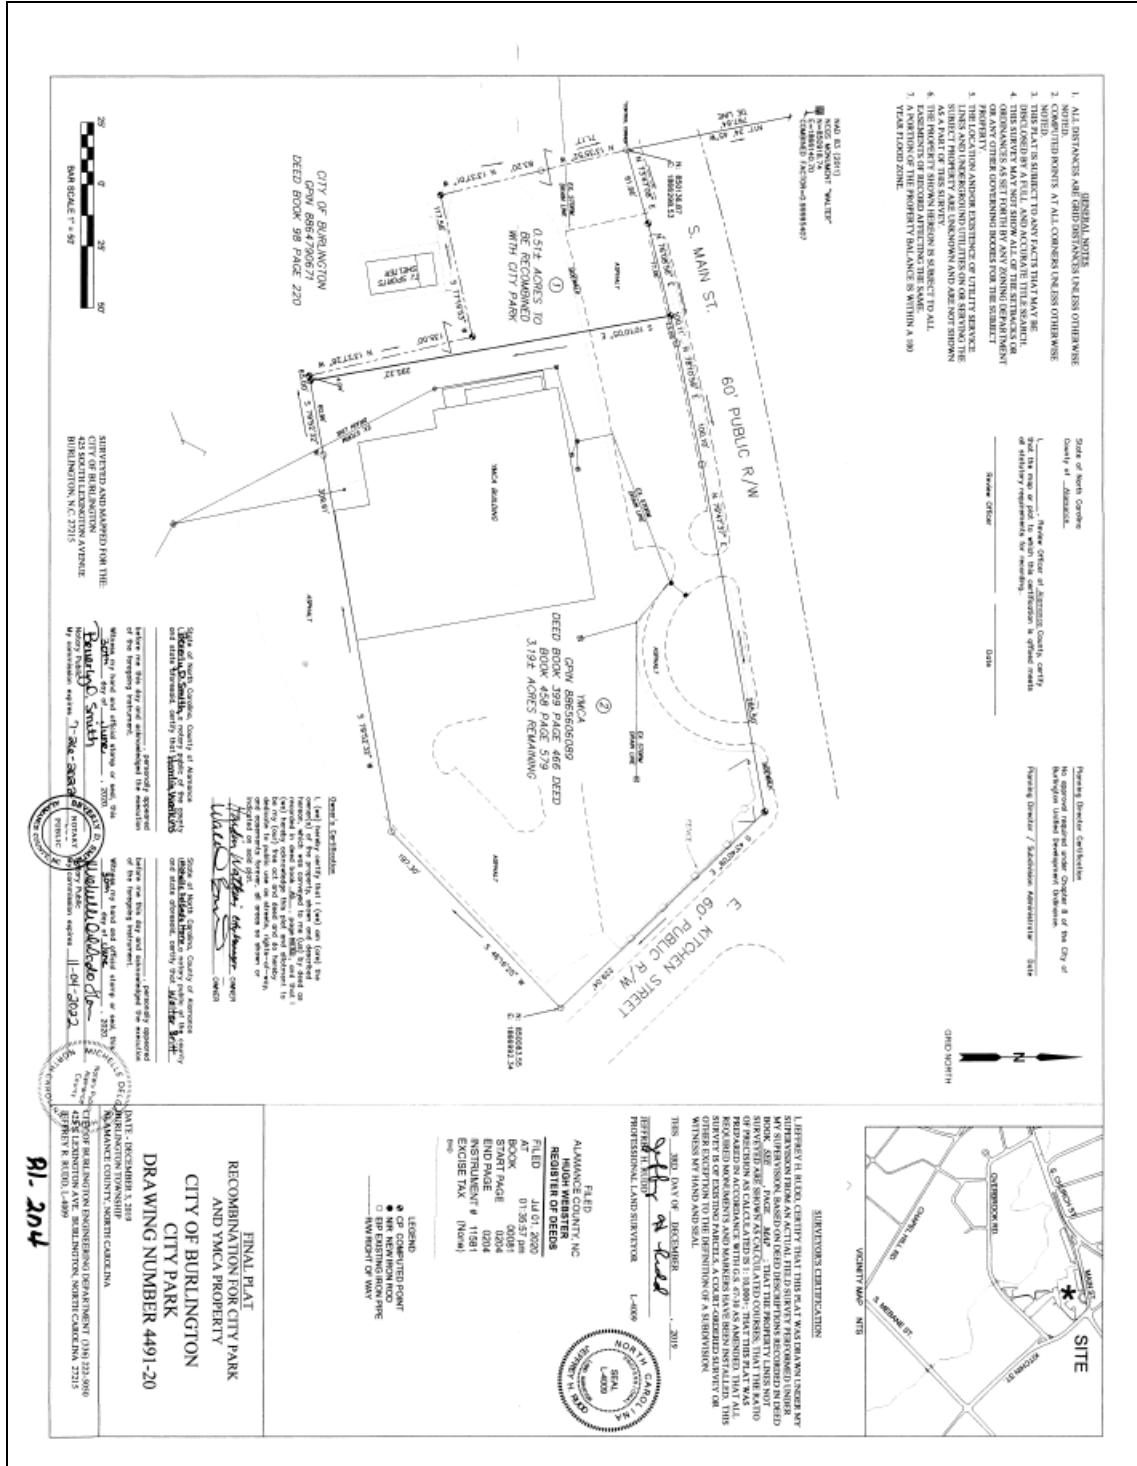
Site Plan, Menagerie Carousel 1386 S. Main St., Burlington, NC
